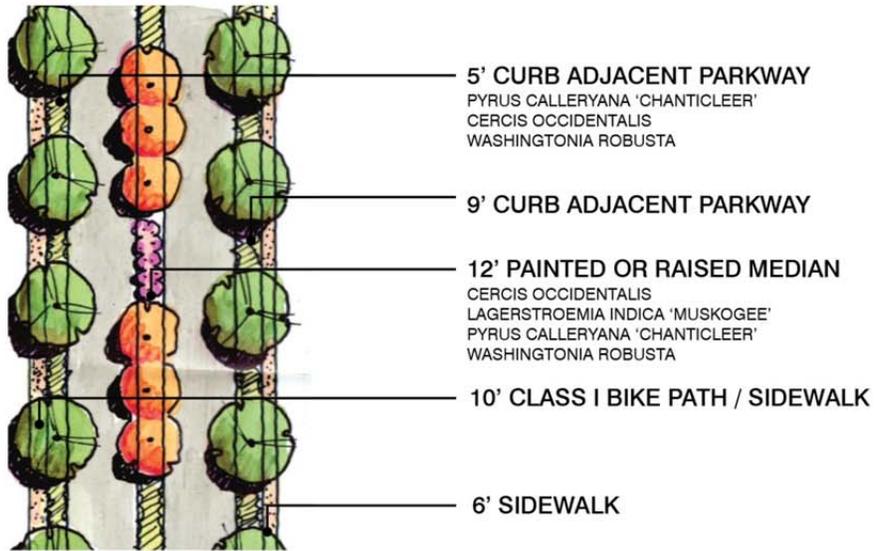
A. Street Sections: Florida Avenue / Warren Road
